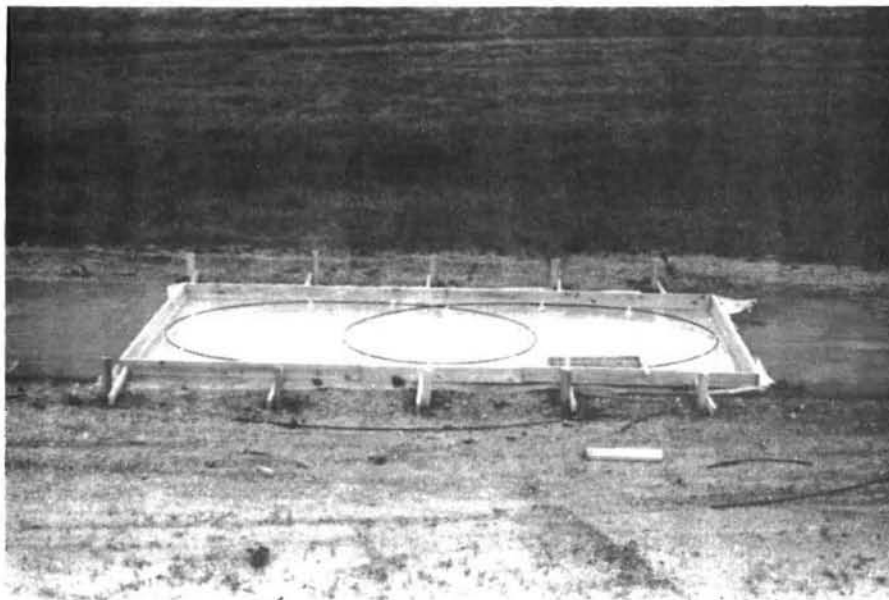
Layout of Test Slab No. 4 before casting the concrete.
